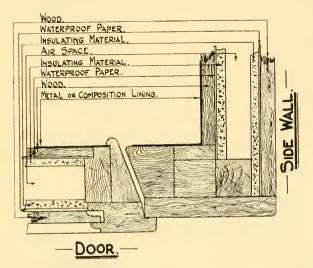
TYPICAL REFRIGERATOR WALL AND DOOR CONSTRUCTION.
